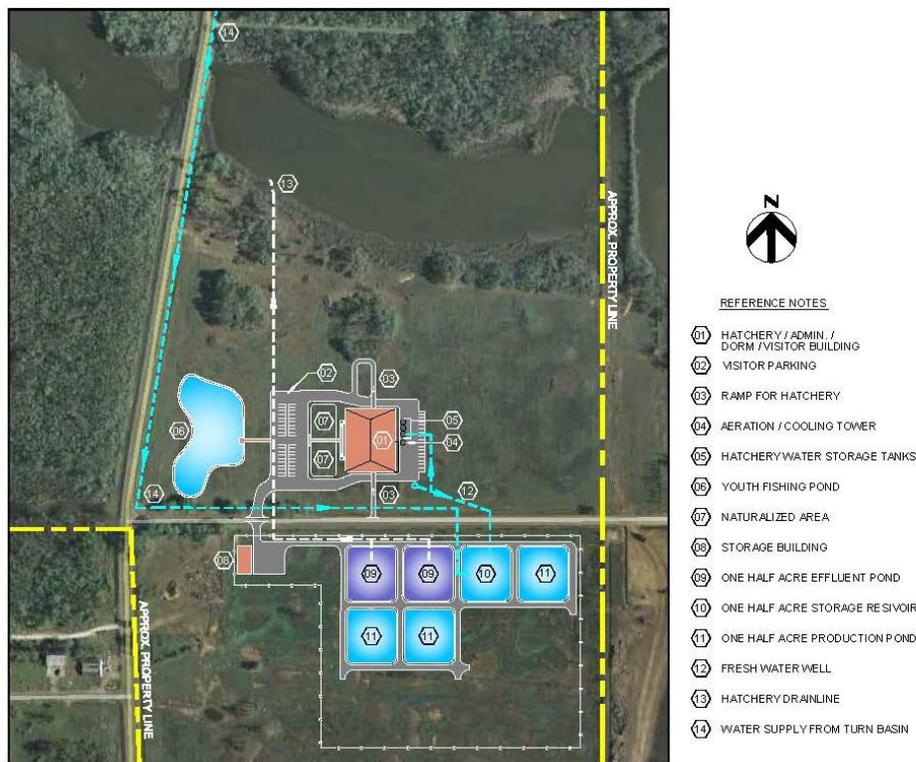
Proposed site plan for the Calcasieu Parish facility.
